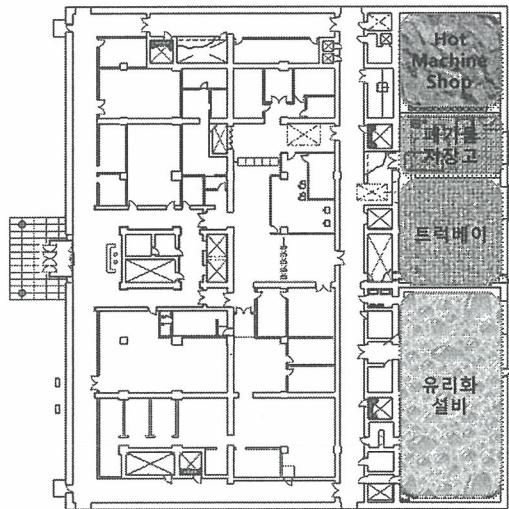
Compound Building General Arrangement(Draft) of APR+ (EL 100')
